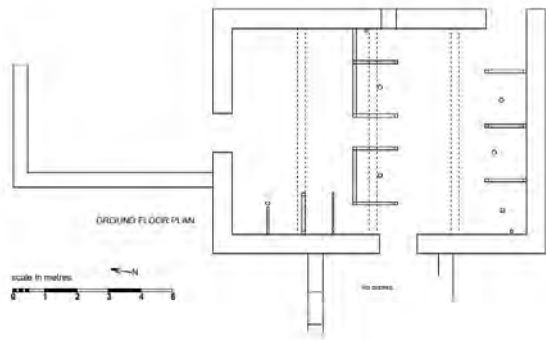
Ground floor plan of bank barn (drawn by Lynne Seignot, Crosby Ravensworth parish).
